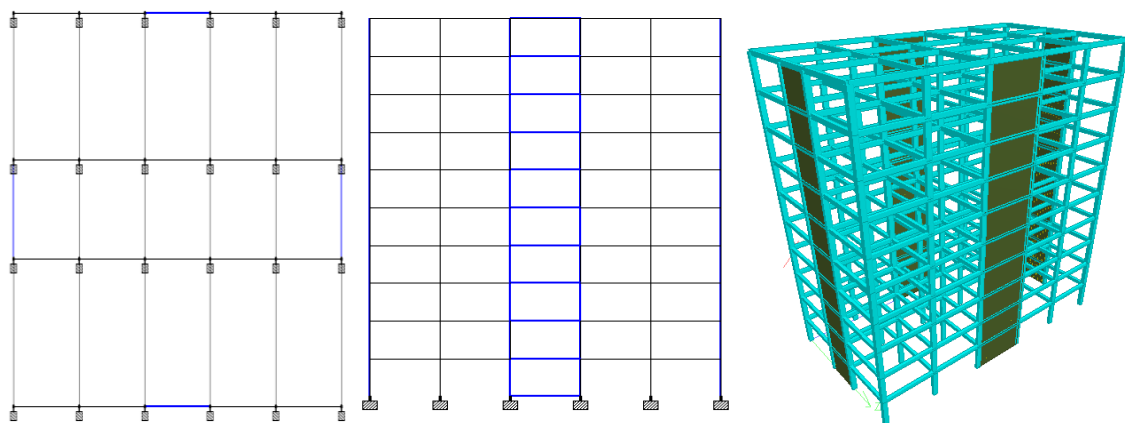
Plan and 3D View of a (G+9) Storey Building Frame With Shear Walls
